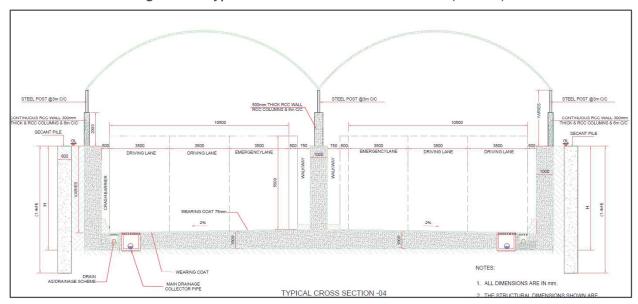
Typical Cross Section RAMP Structure (3 lane + median wall + 3 lane)
